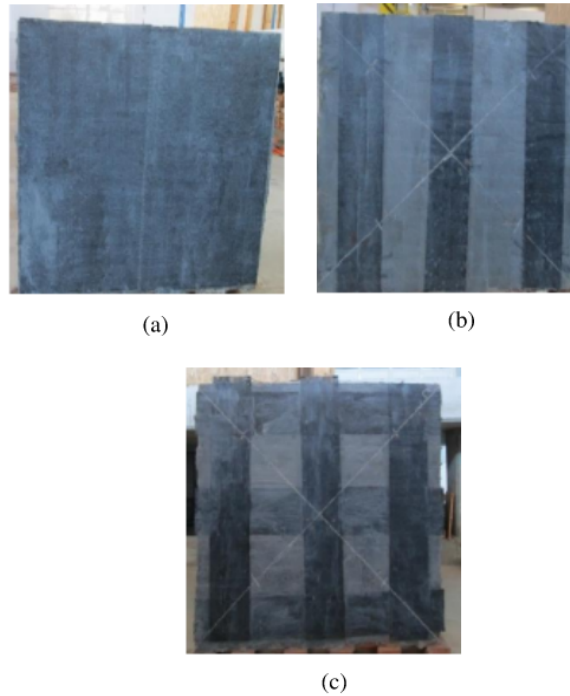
(a) Wall Completely Covered w/ CFRP (b) Wall w/ 3 Vertical Strips of CFRP (c) Wall w/ 3 Vertical & Horizontal Strips of CFRP
